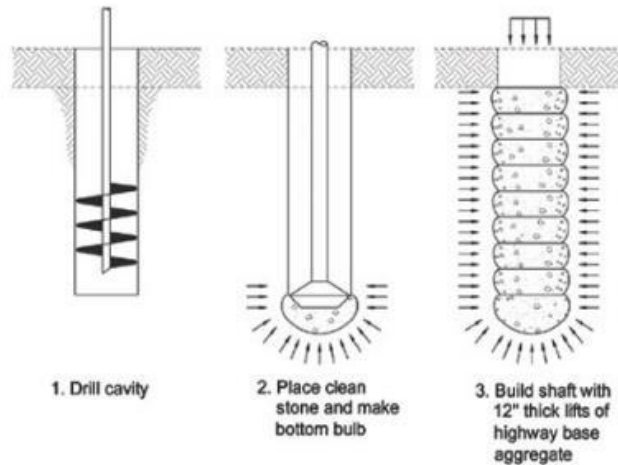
Schematic Details of Rammed Aggregate Piers (www.csengineermag.com)
